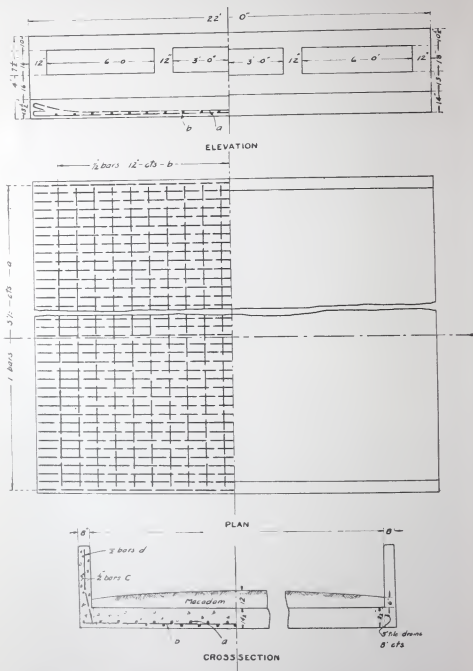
Concrete Superstructure of 20-foot span, 12 to 20-foot roadway. Designed by the Illinois Highway Commission.
